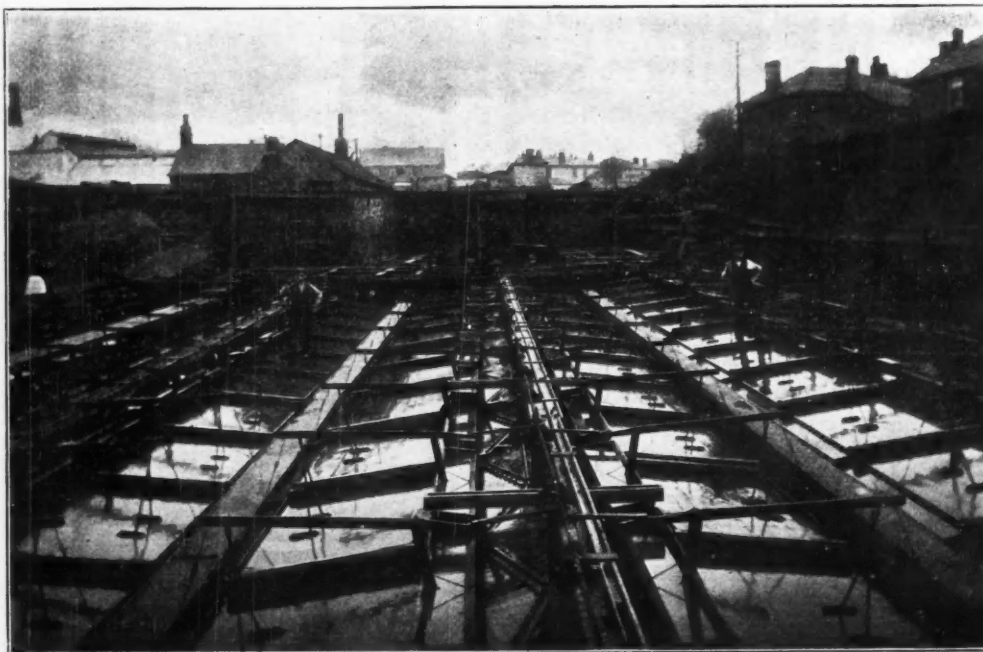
COAD'S DISTRIBUTOR, TUCKING MILL STREAM.
